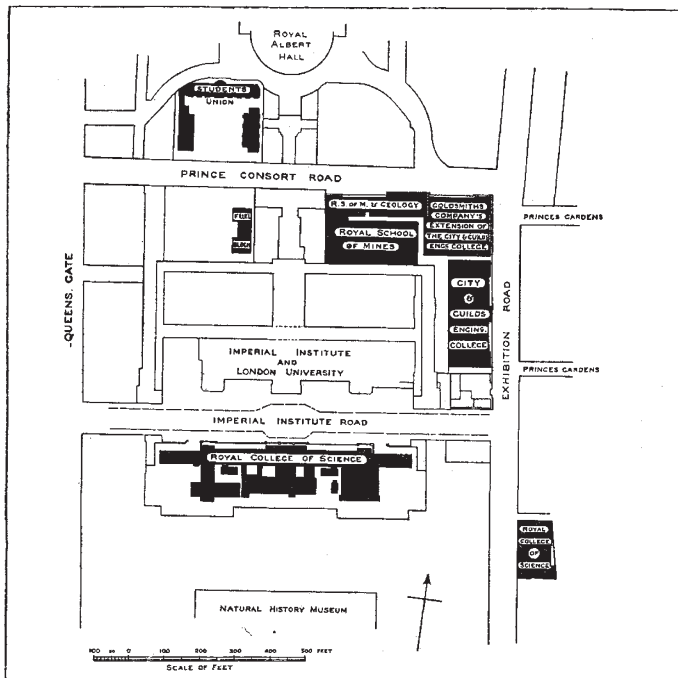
General plan of the associated buildings which have been erected on the site of the 1851 Exhibition. The areas coloured black indicate the buildings of the Imperial College of Science and Technology.
